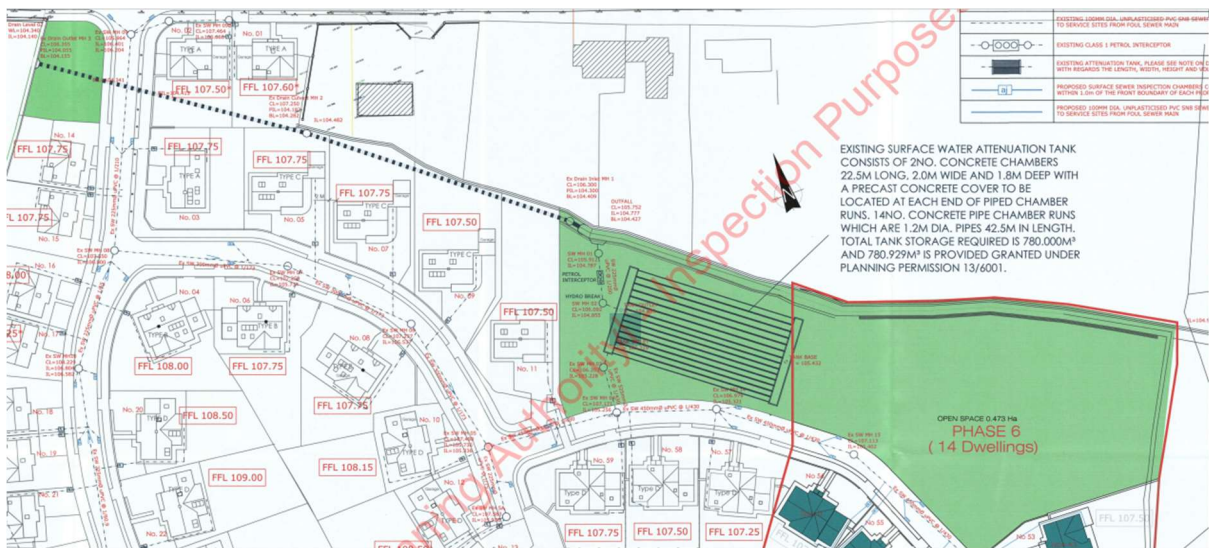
Planning diagram indicating culvert (dotted) and open stream
